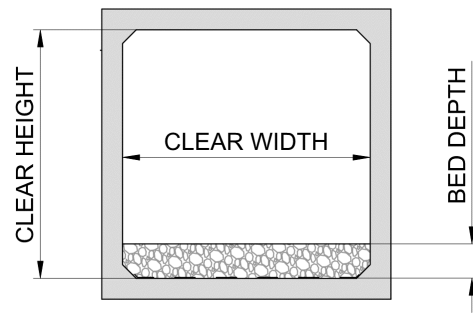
Cross section at hydraulic culverts and mammal underpasses box structures
